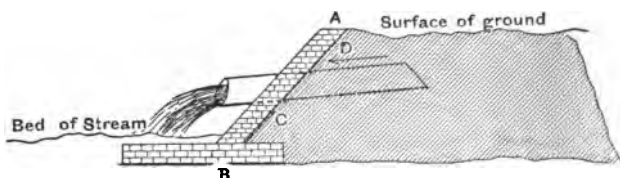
represents the section of such outfall. The face A B should be well thrown back and the masonry provided with outlet pipes or weep-holes at D and C. It should rest on a good footing at B so as not to be undermined by its own delivery of water. This plan is to be strictly adhered to in all outfalls. The writer has seen outfalls entirely obliterated for want of such works, which should, in the case of a pond, be protected from the tread of cattle drinking.
